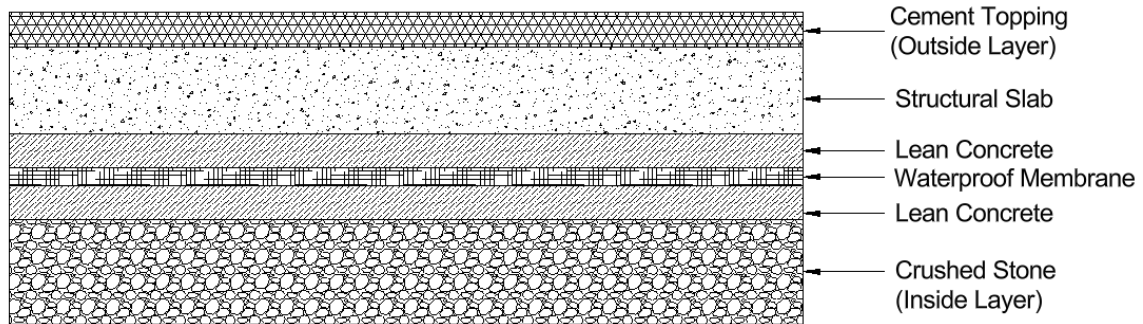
The Construction Design for the Montpetit Hall Underground Floor
